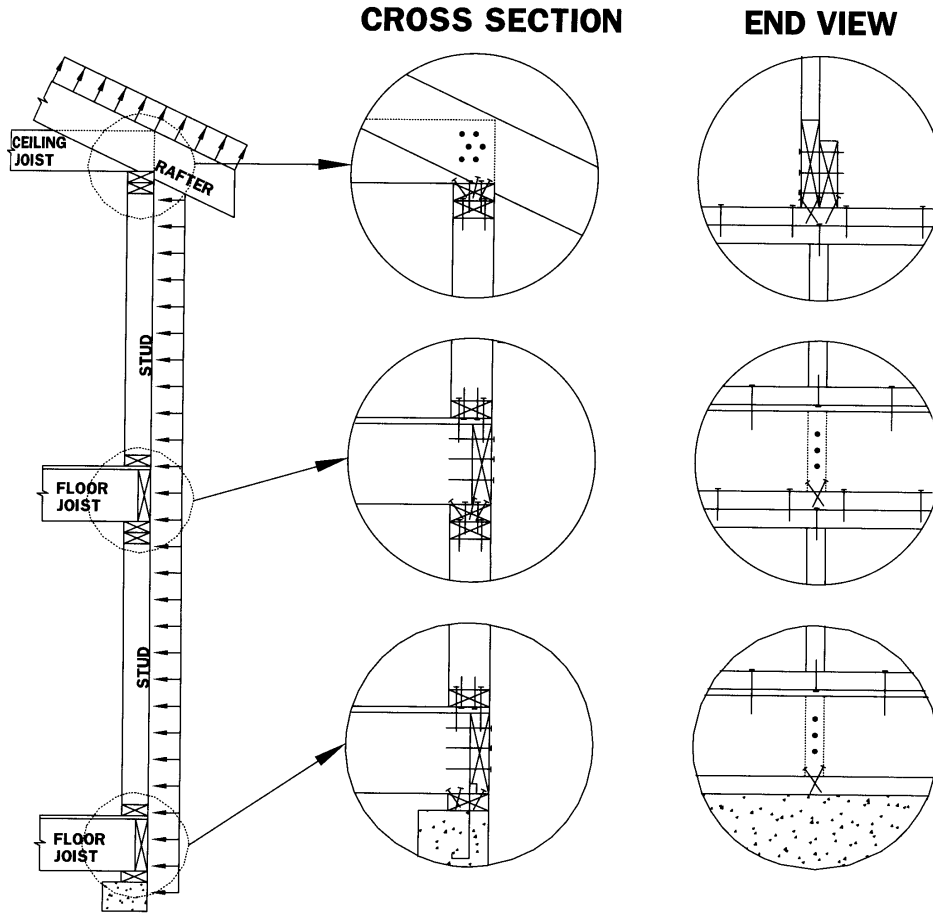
Typical Nailing Patterns for Wood Frame Wall Structure of Residential Construction (AFPA/AWC, 1996)
